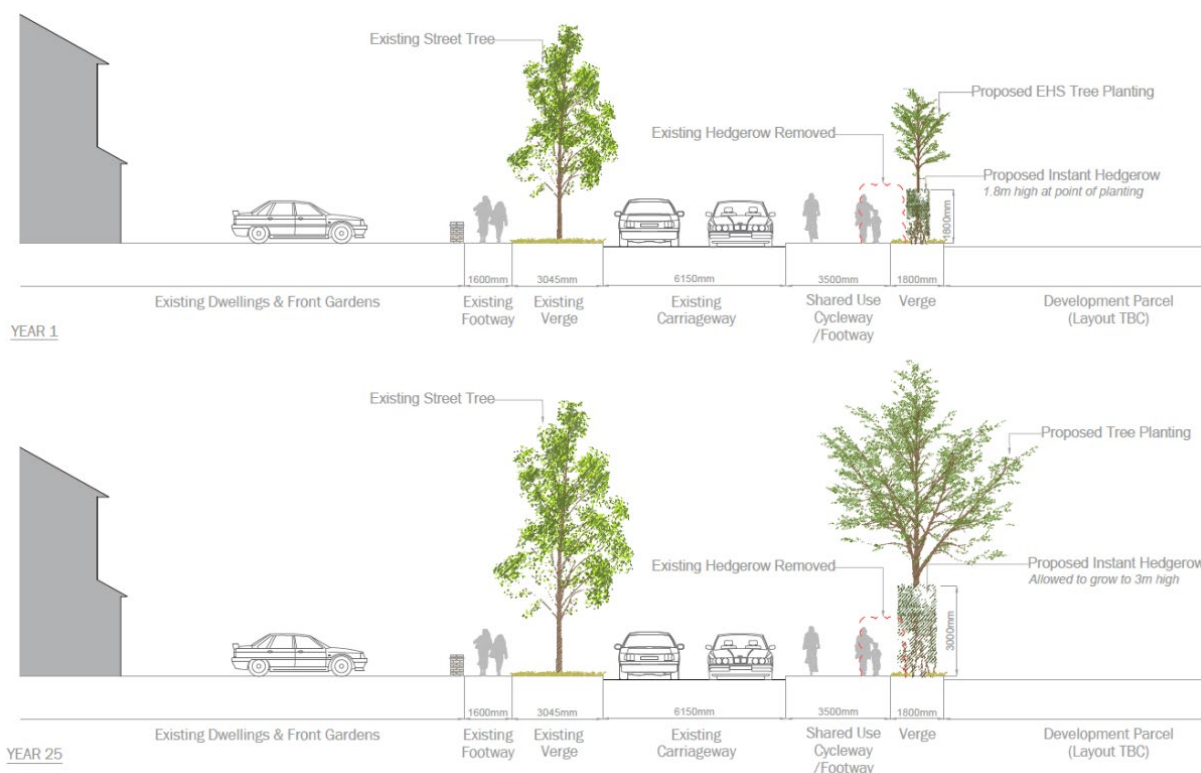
Illustrative cross-section of proposed 'instant' hedgerow
